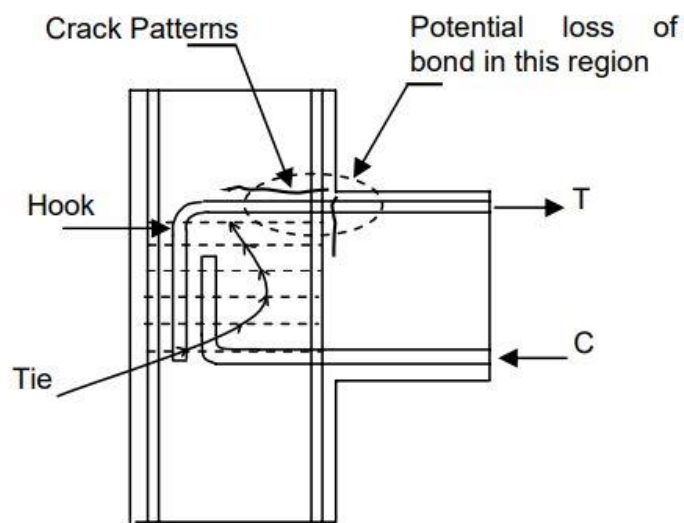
Detailing to improve bond mechanism at exterior joints (Uma and Prasad 2006; Jahan 2016)
